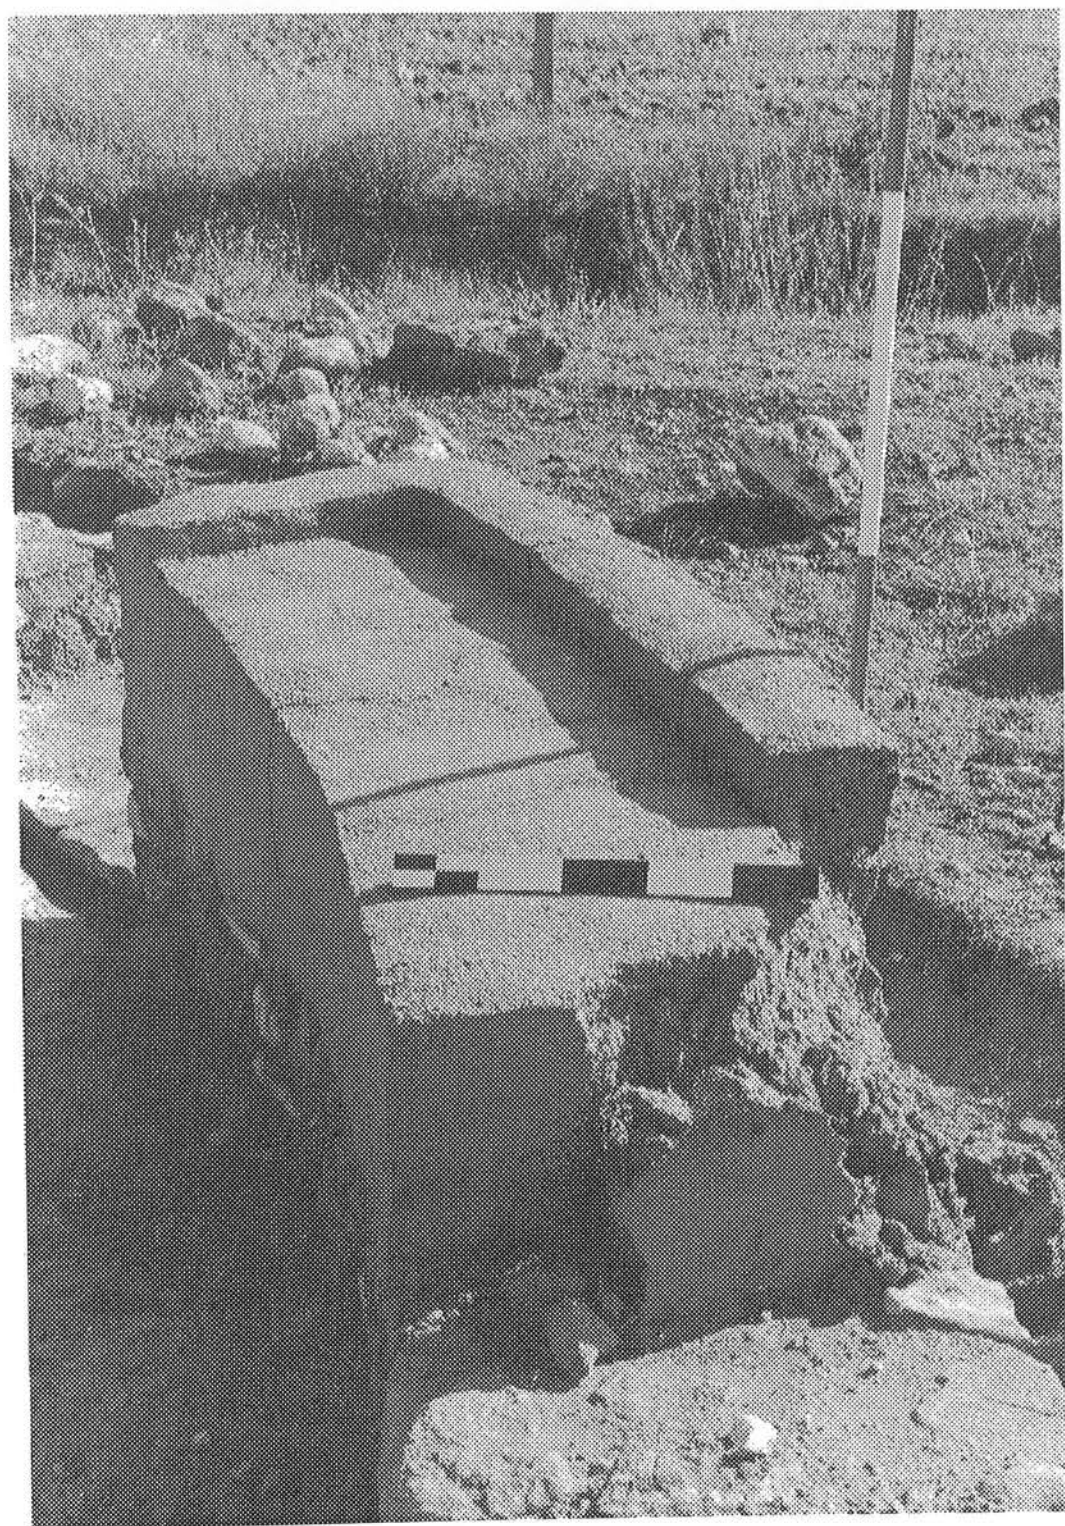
LEV, mudwall test construction on stone footing of RH1.
